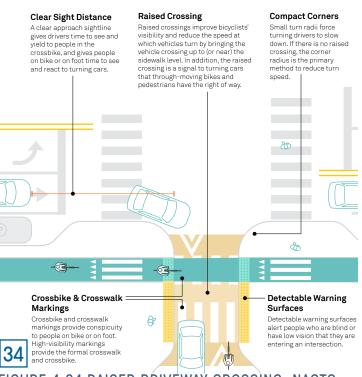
RAISED DRIVEWAY CROSSING, NACTO
